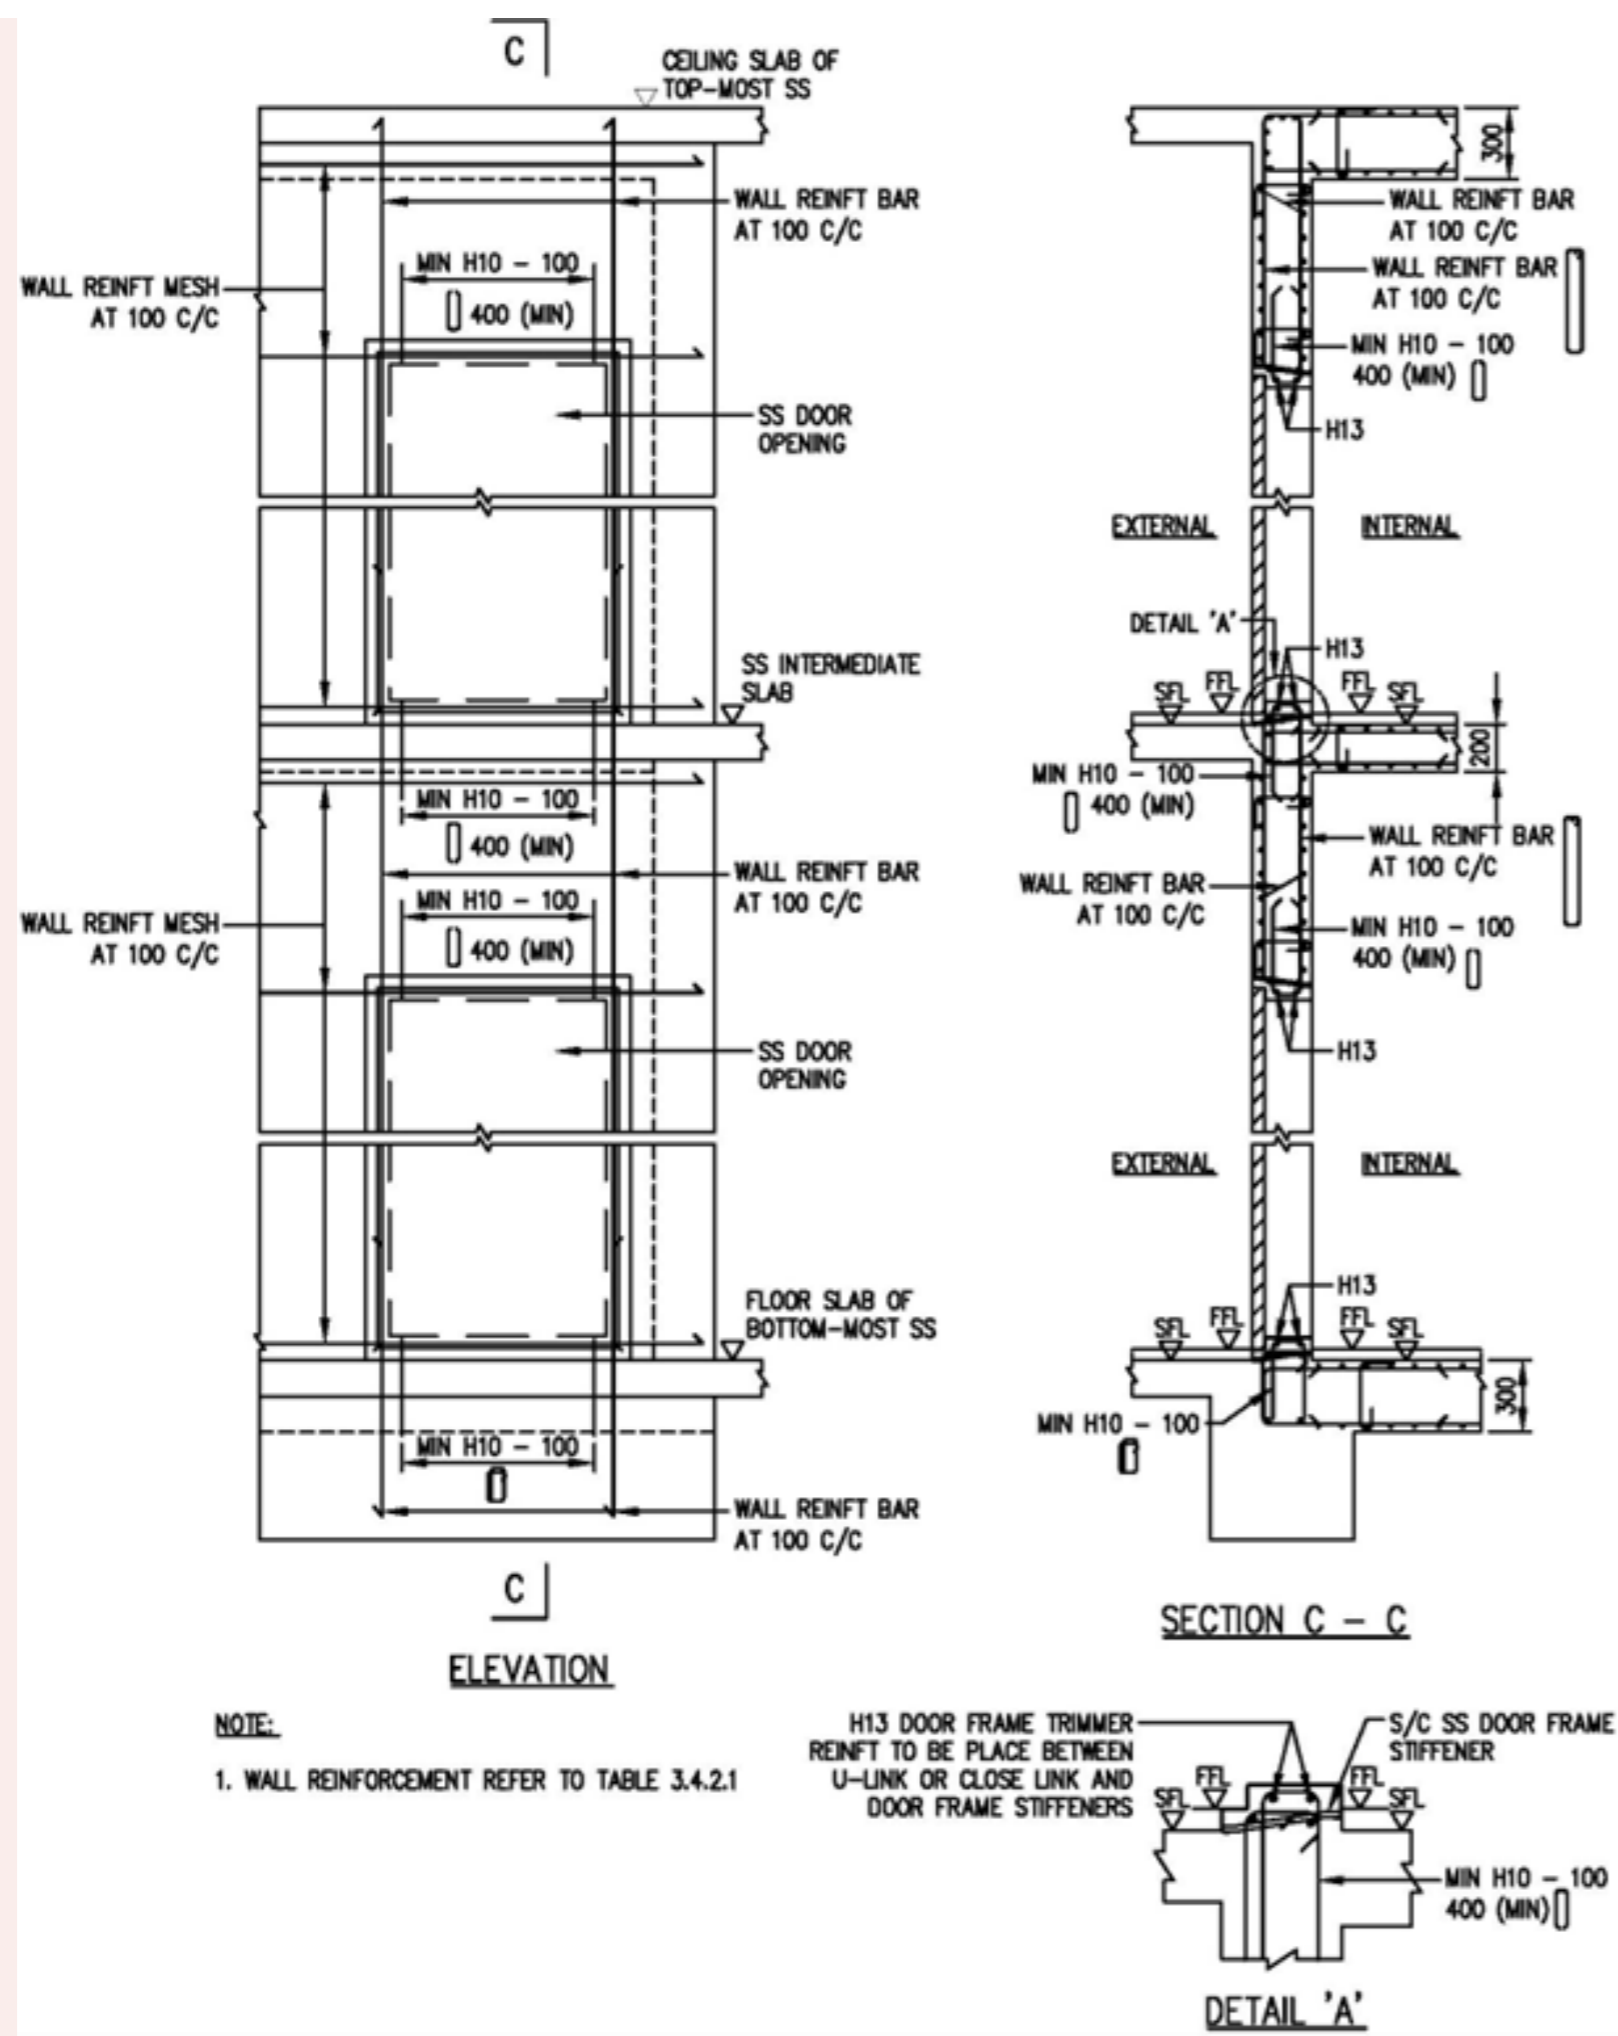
(d)(ii): DETAILS OF SS WALL REINFORCEMENT BARS NEAR SS DOOR
